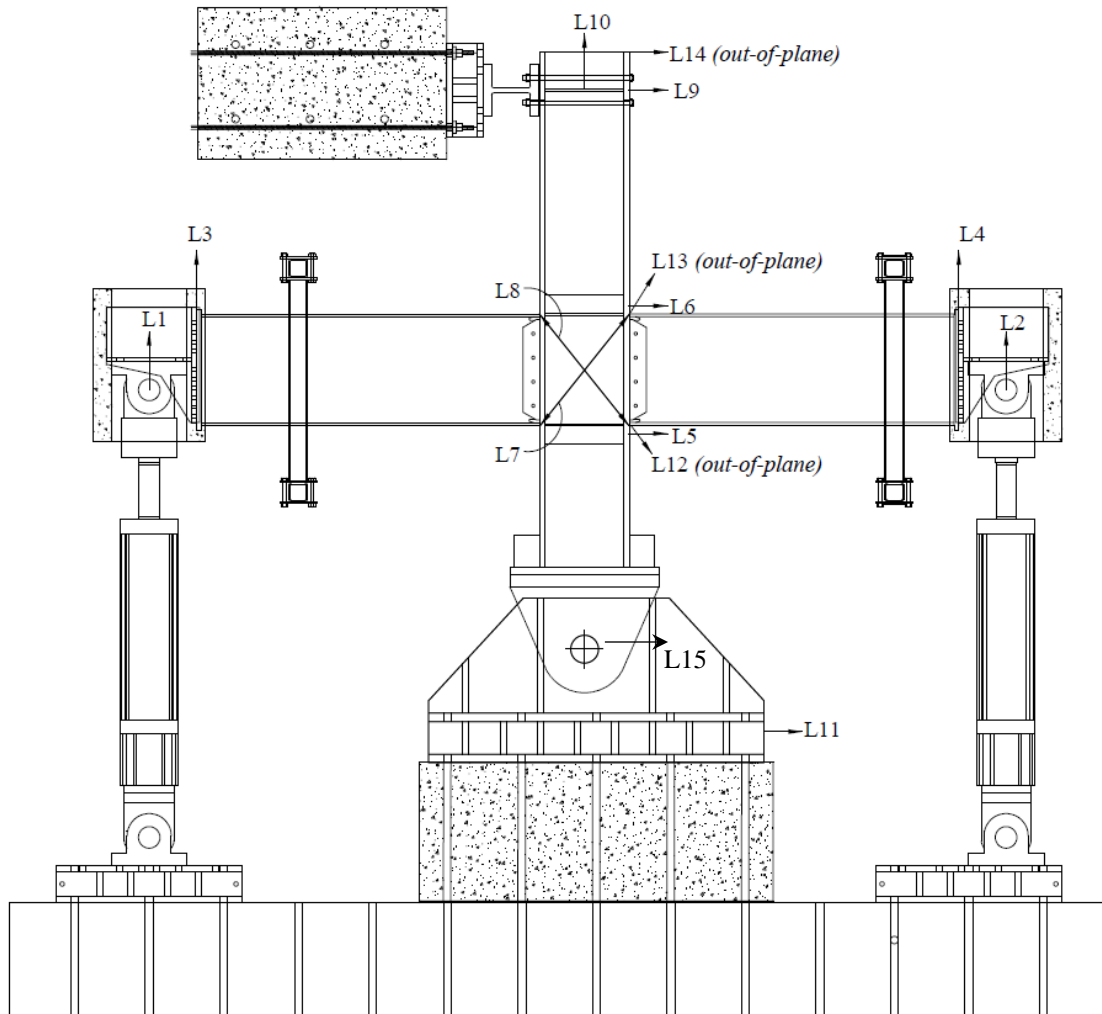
Interior Moment Connection (Specimens W1 to W4) Transducer Layout
